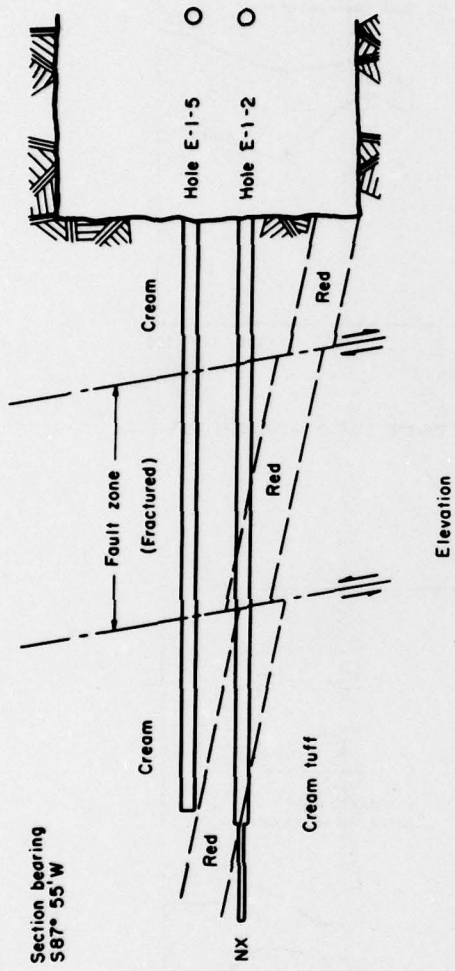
Sketch of probable structure at drilling site - tunnel E
